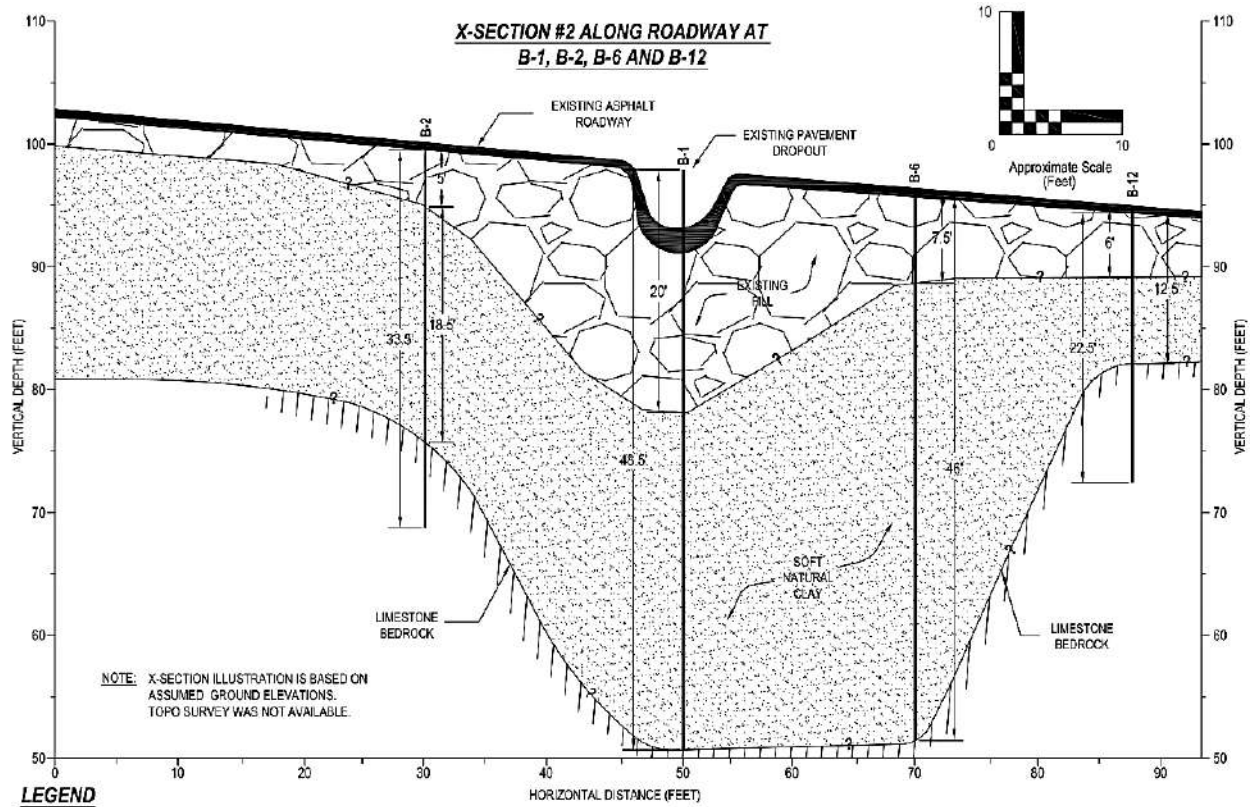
Cross section of pavement and location of some borings within the existing dropout
